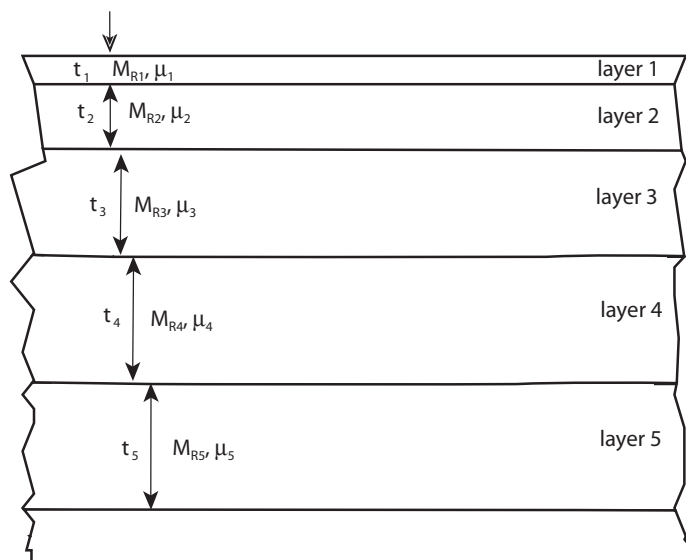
Typical Pavement Structure Showing Elastic Layers
